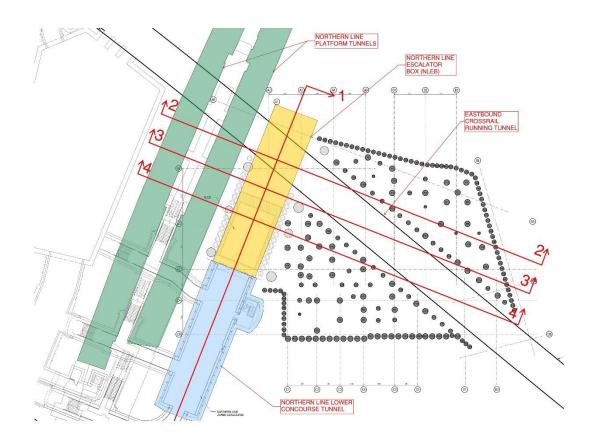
Plan of modelling sections through NLEB (Appendix P)
